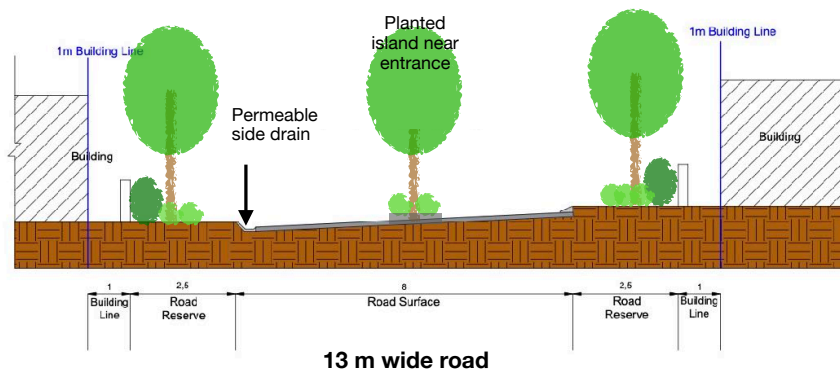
Cross Section through 13m streets (Fountain/Spring Streets adjacent to Entrance Gates)
